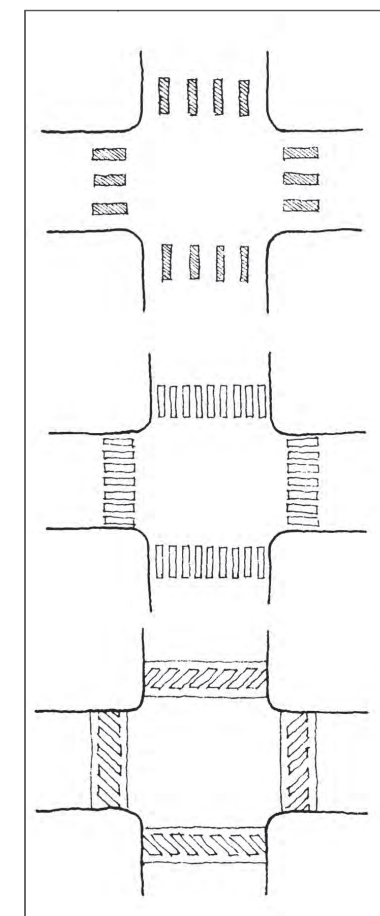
Possible crosswalk markings for unsignalized, marked crosswalks
